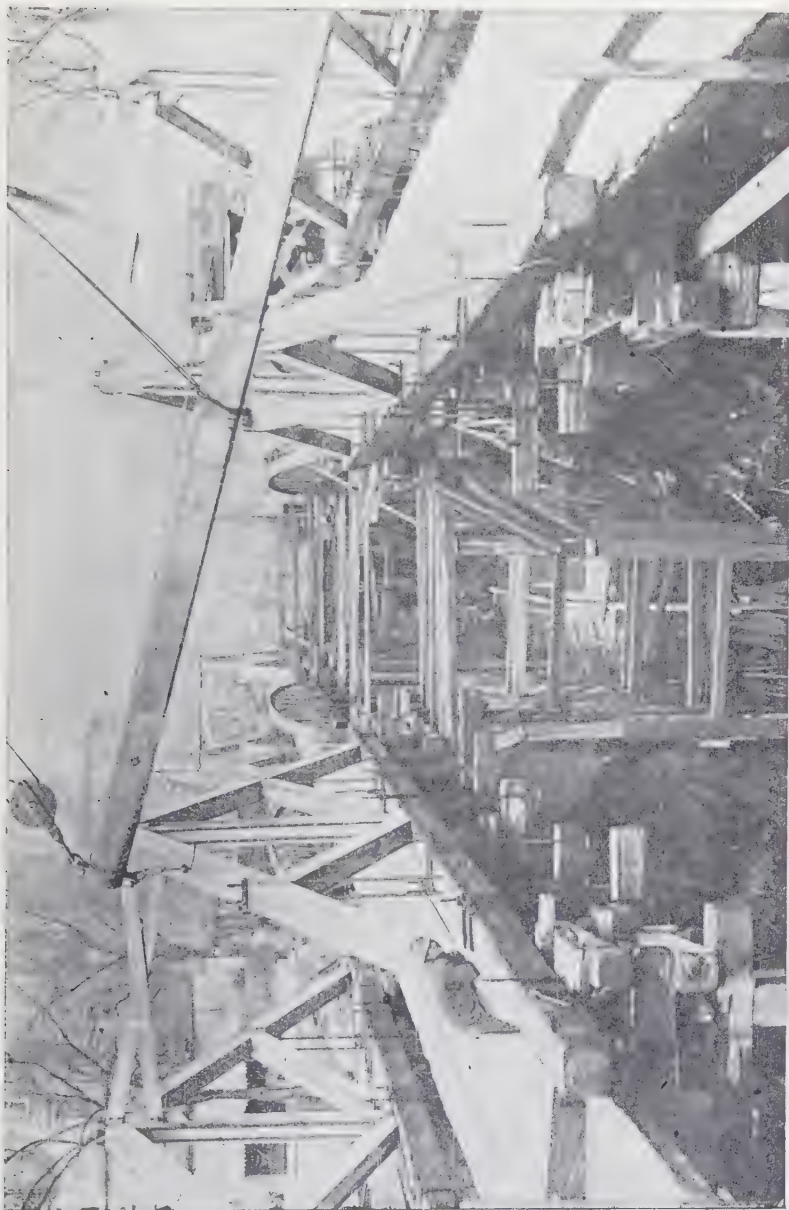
Trusses Supporting Street Railway Tracks during Construction of New York Subway.
